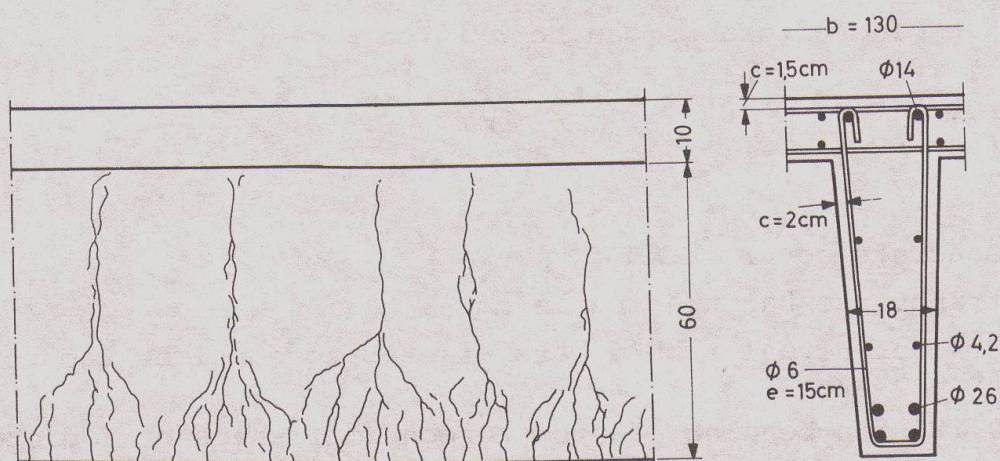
Cracks of a T beam prove that the small crack spaces and the corresponding small crack widths obtained by the four bars $\phi 26$ mm in the bottom flange are restricted to a small zone around the bars. Outside this zone, the web reinforcement was too weak to prevent wide cracks
